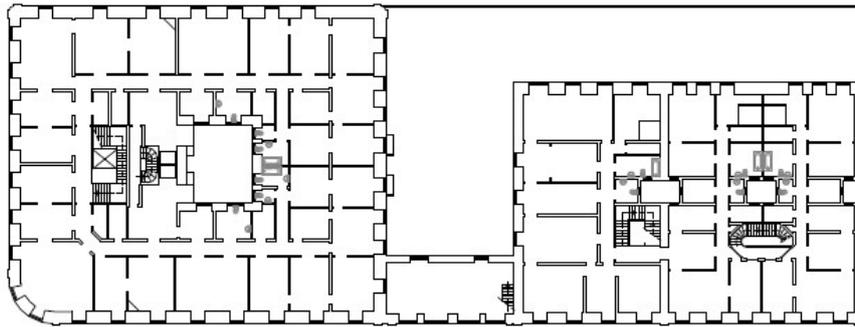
Plant of the existing buildings (Block A at the left, connecting building at the centre, Block B at the left)
